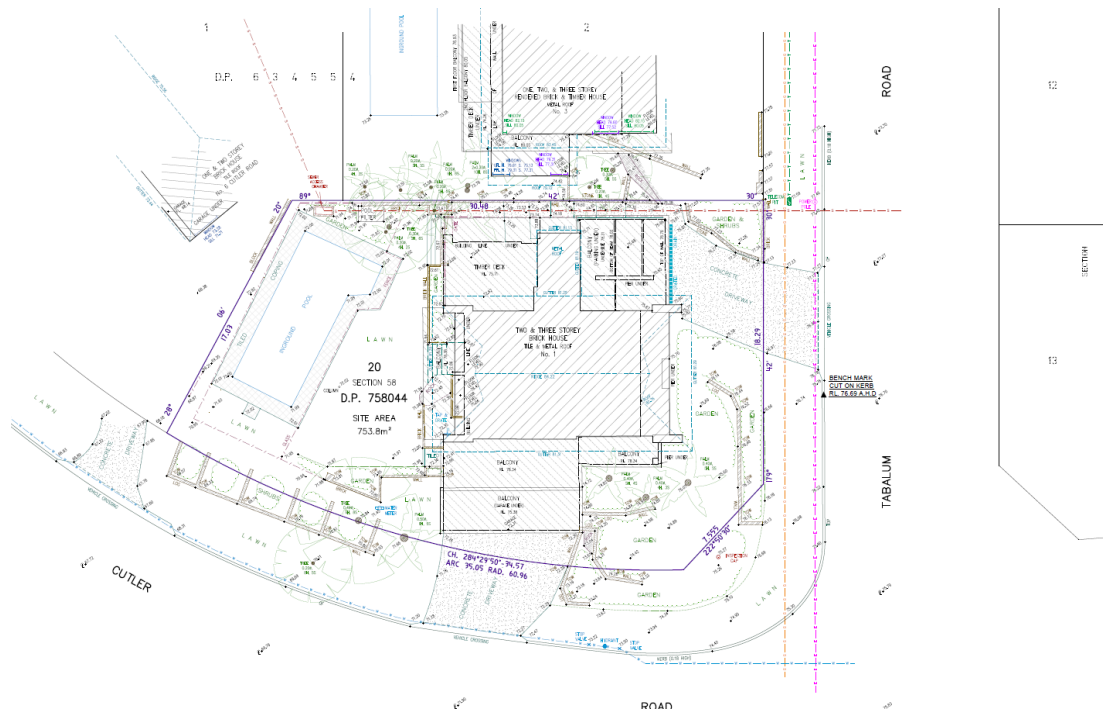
Extract Level & detail survey (source: Bee & Lethbridge Surveyors)
